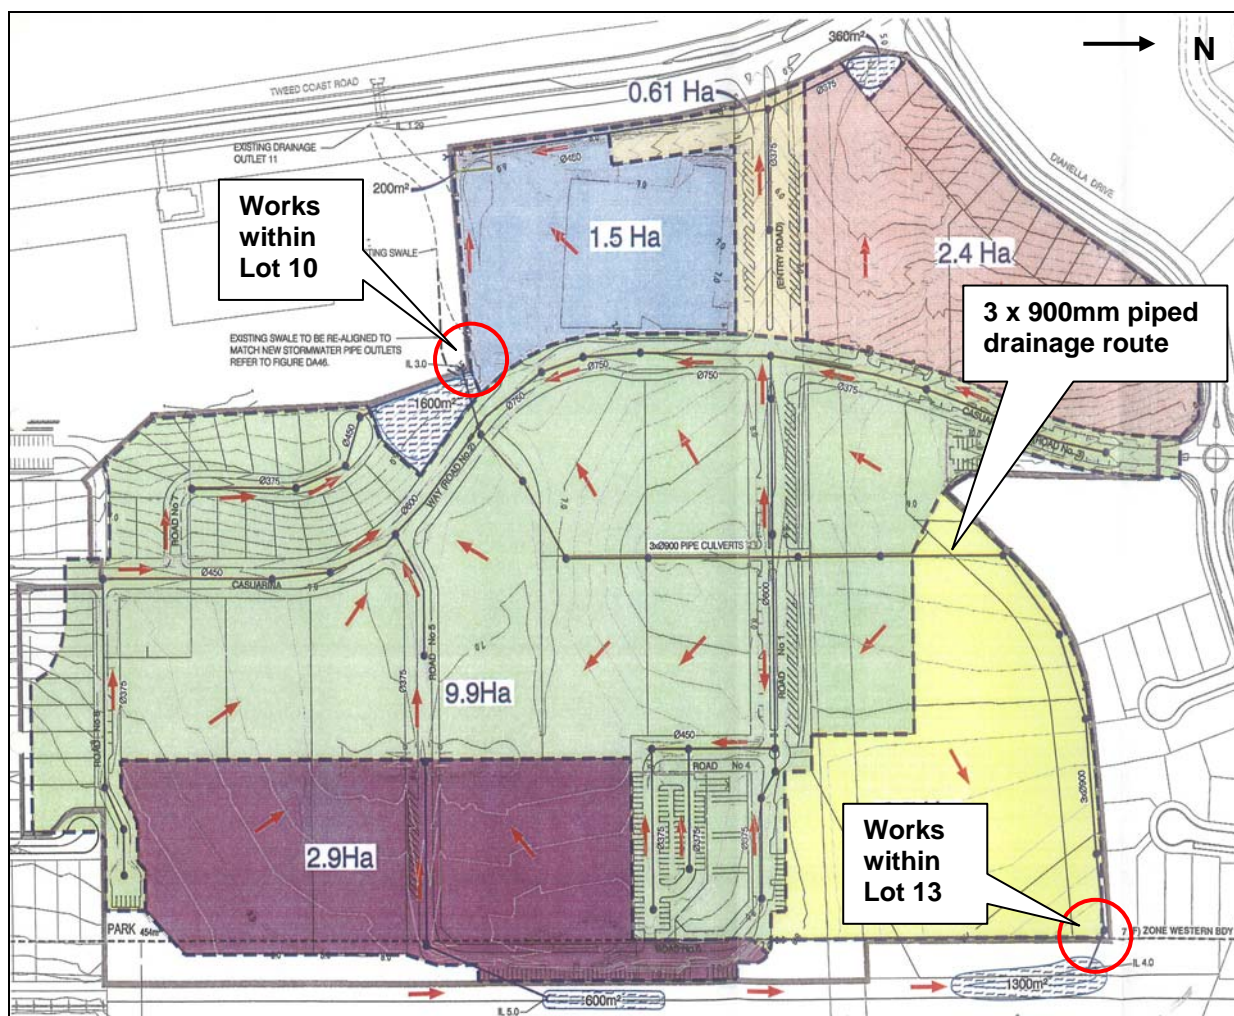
Proposed Stormwater Drainage Plan (source: S75W Report)
